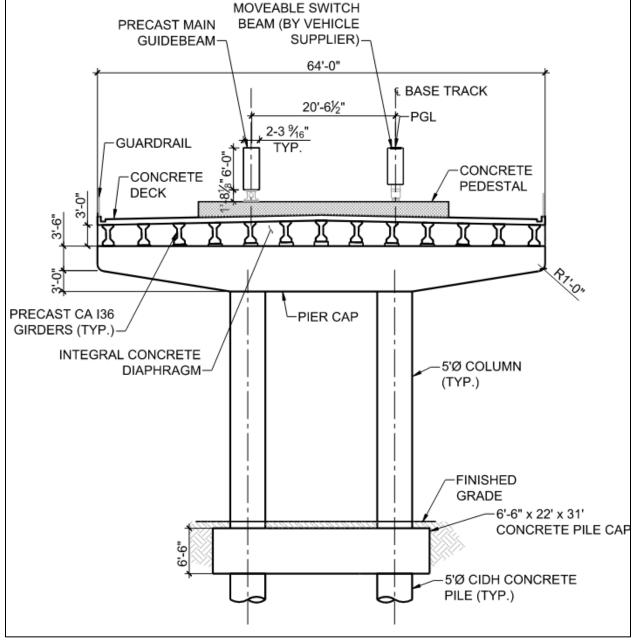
Typical Monorail Beam Switch Cross-Section
